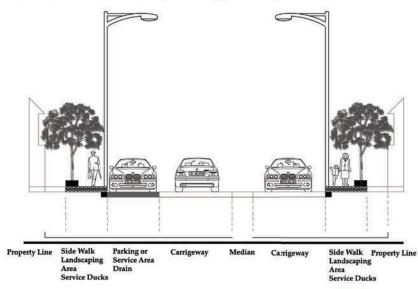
Cross section of a Level O2 – General Road - (Road Type – 2-B)
